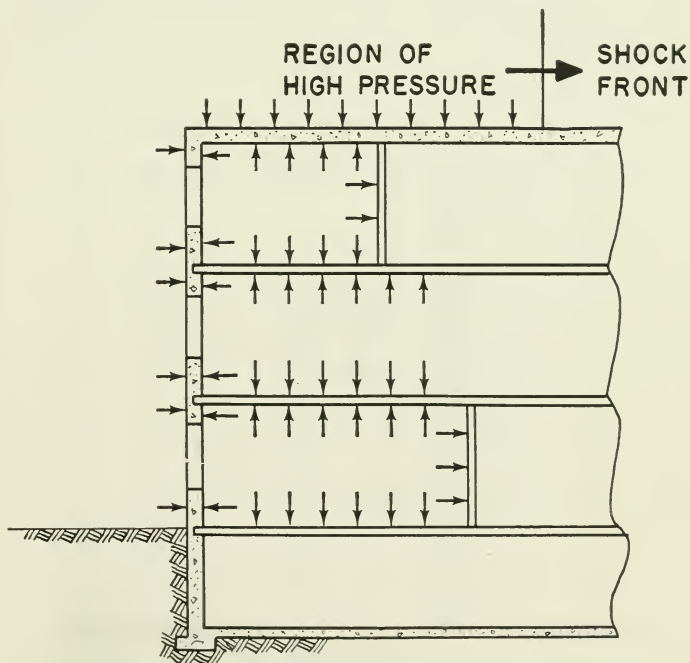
Pressure on exterior and interior walls and slabs.
